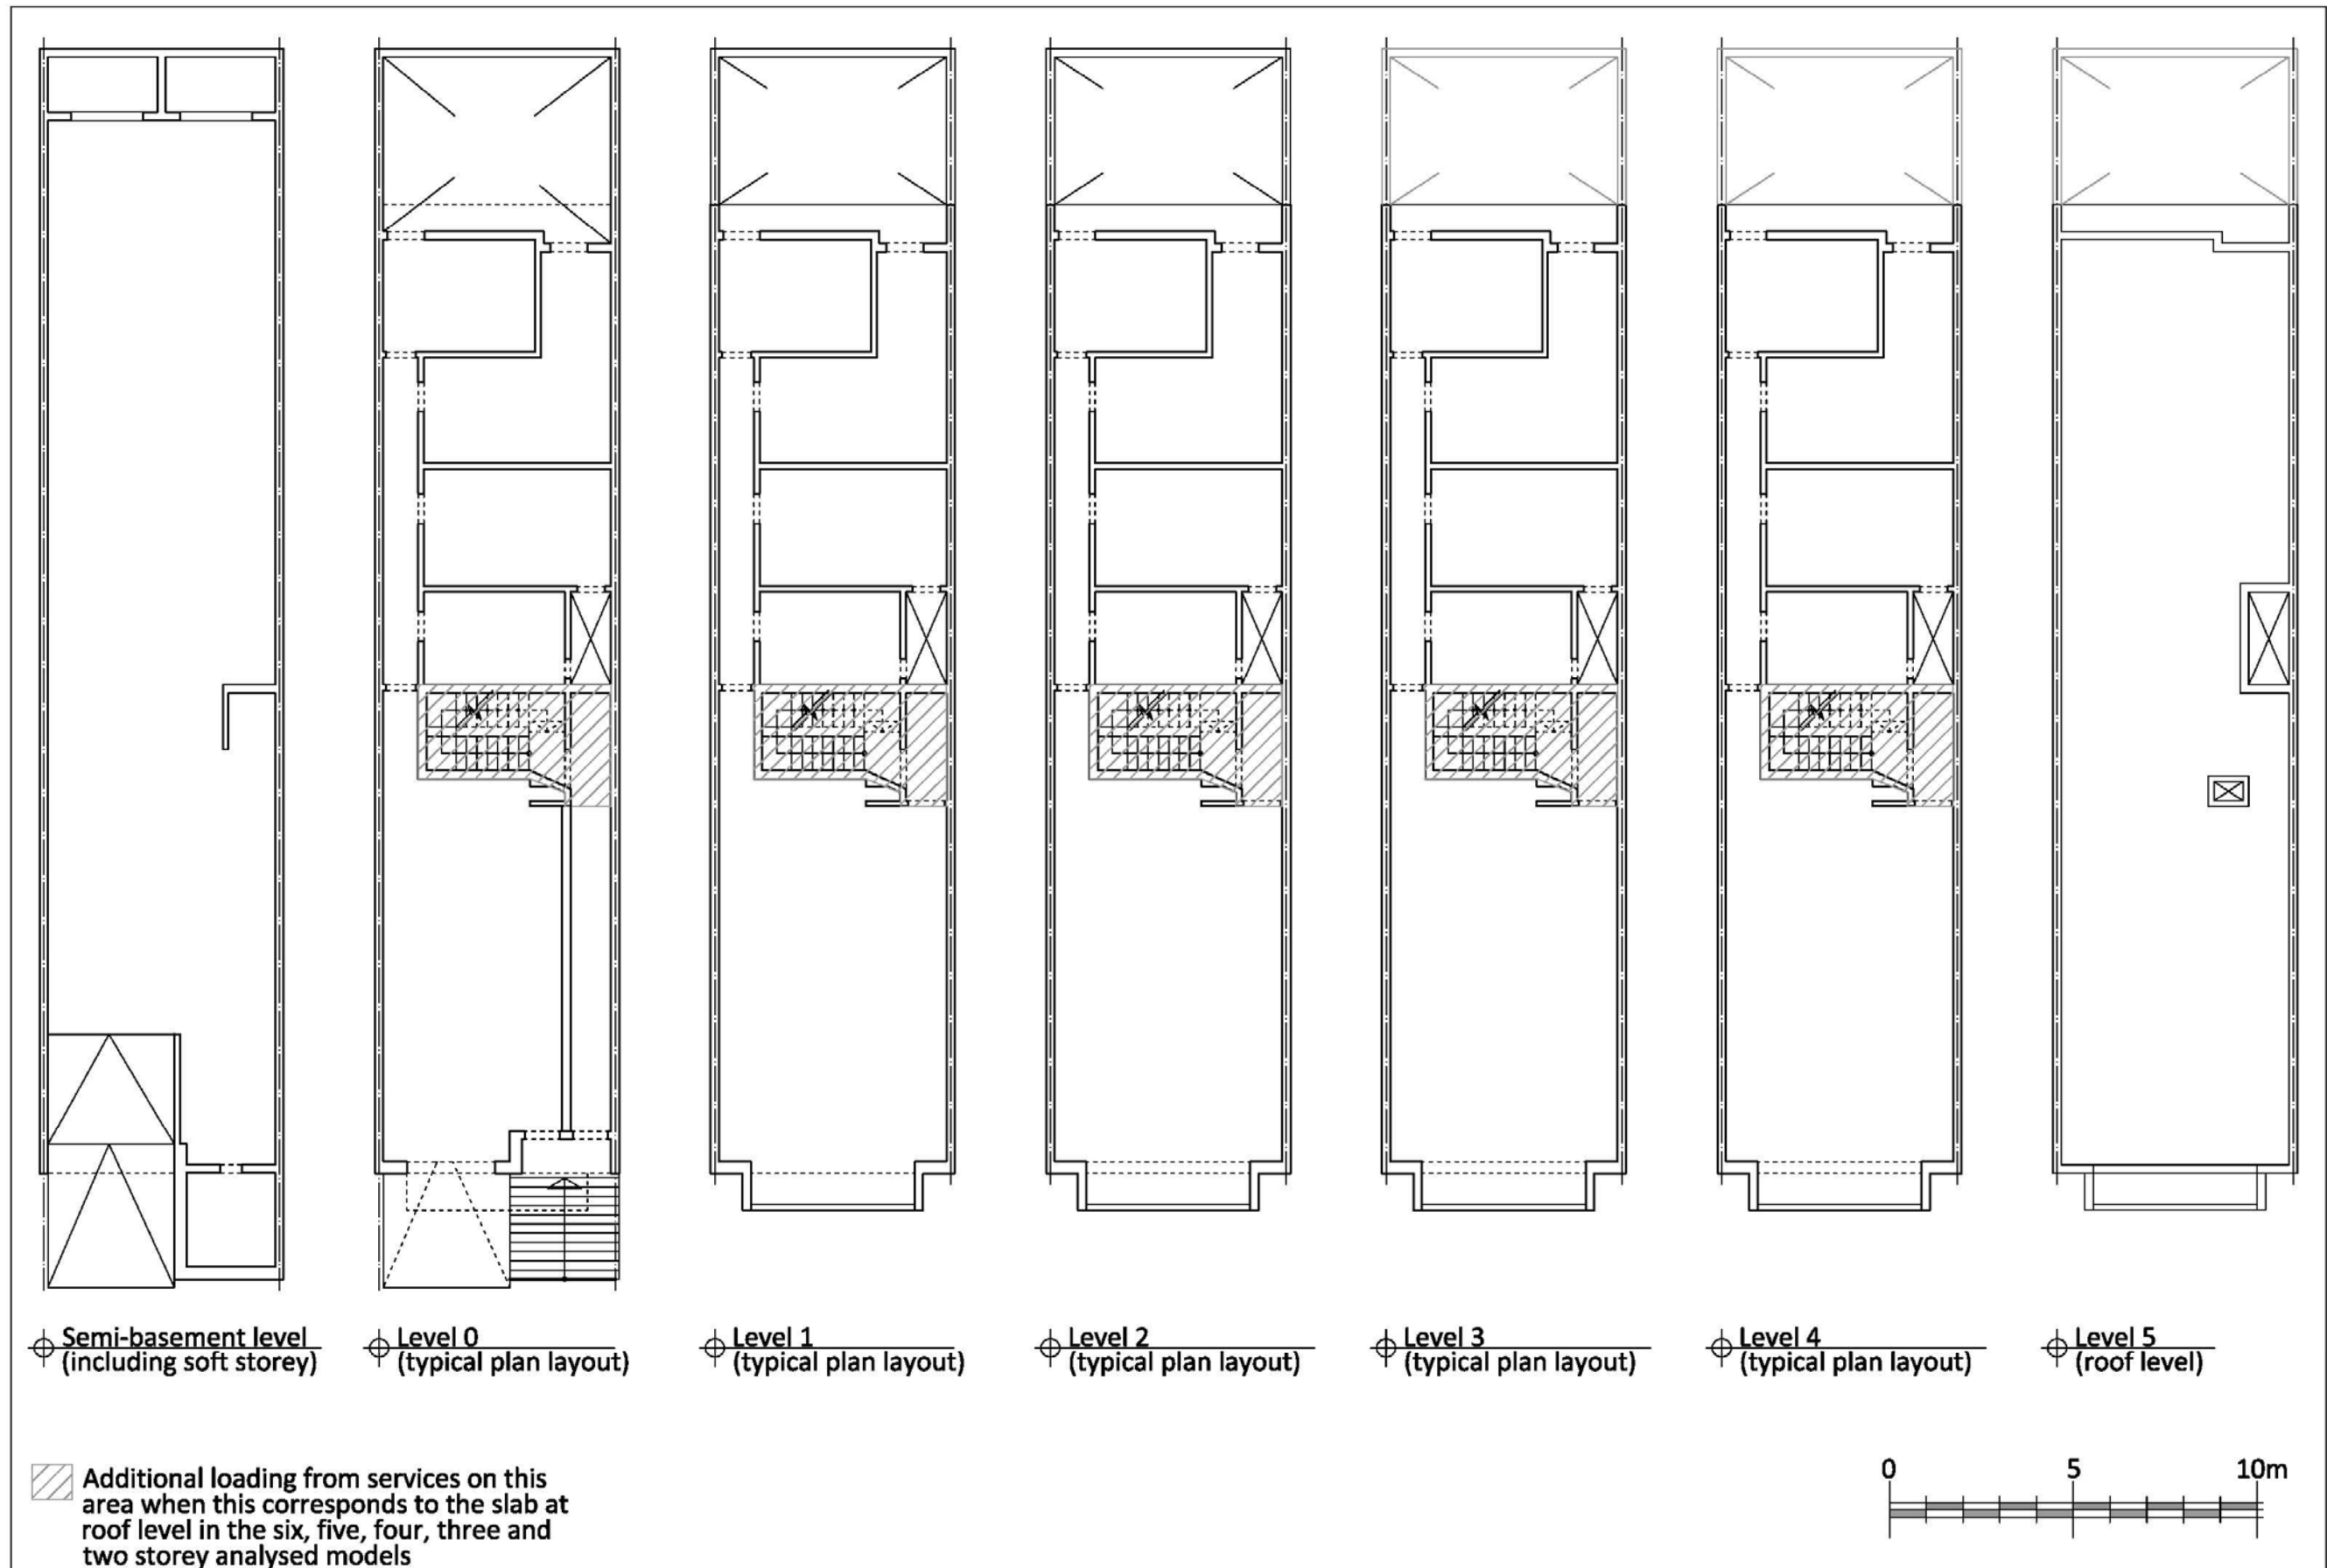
Plan layouts at all levels for analysed single building numerical models including a soft storey at semi-basement level and with extended plan layout proportions (plan length-to-width ratio 4:1).
